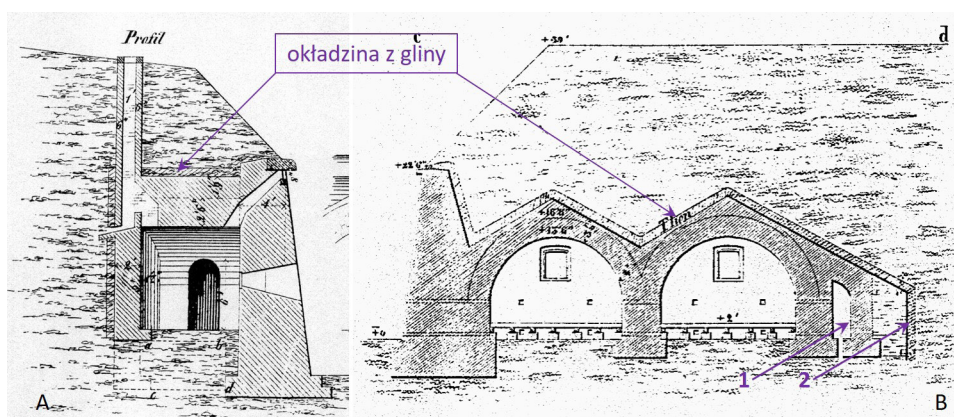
Examples of use of clay cladding on earth covered walls and vaults in fortress buildings, according to Moritz von Prittwitz, *Beitrage...*, Taf. 30, 53 (fragments): A - shooting gallery, cross section; B - war powder magazine, cross section. Especially noteworthy are: the peripheral corridor (1) and the moving the clay cover away from the earth-covered outer wall of the perimeter corridor running around the gunpowder room (2)
